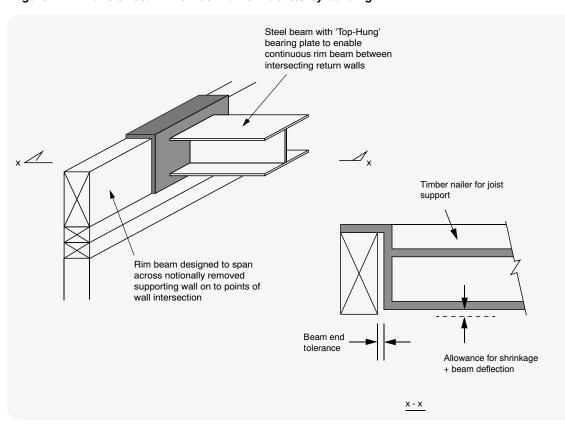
Transfer beam connection to allow rim beam to span continuously to supports.
